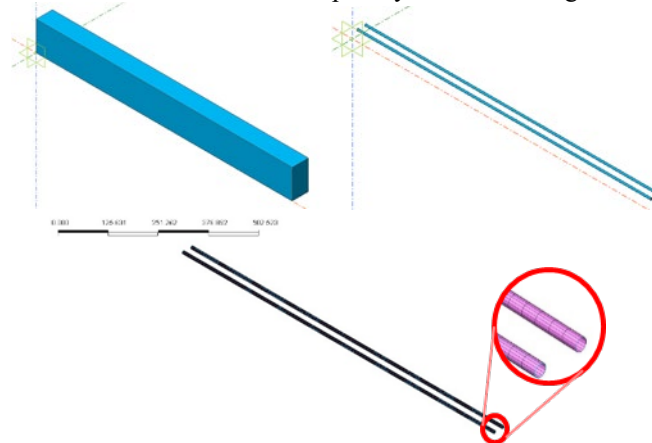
Geometry model of concrete beam, steel reinforcement and interface element
